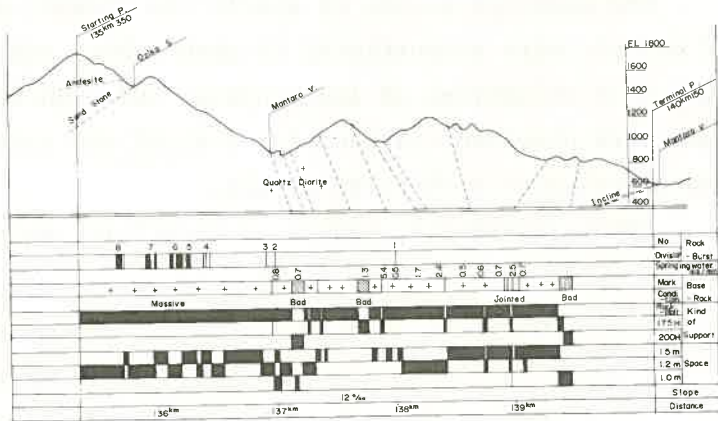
Construction data of central portion of Dai-Shimizu Tunnel(full face excavation)
